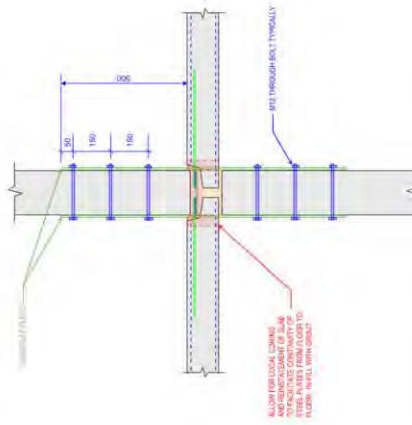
Cross-section view of typical wall-to-wall connection detail with strengthening plate.
